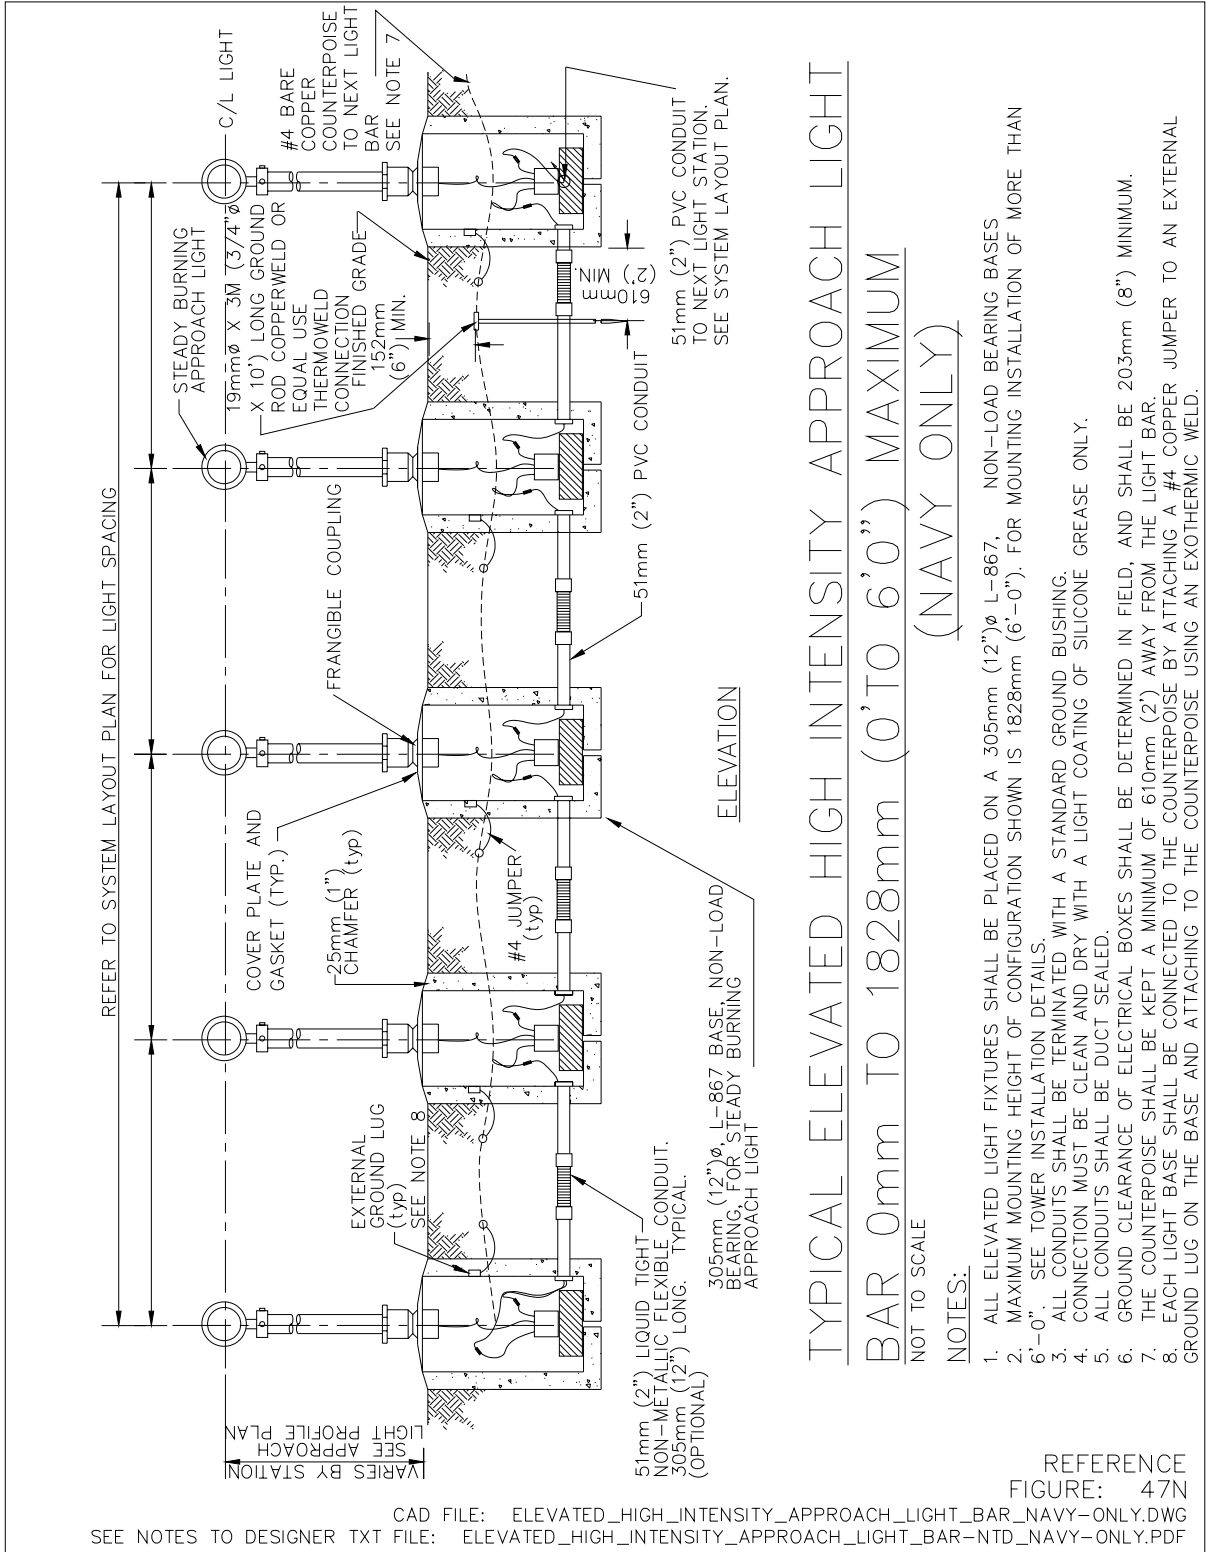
N. Typical Elevated High Intensity Approach Light Bar 0mm to 1828mm (0' to 6'0") Maximum (Navy Only)
